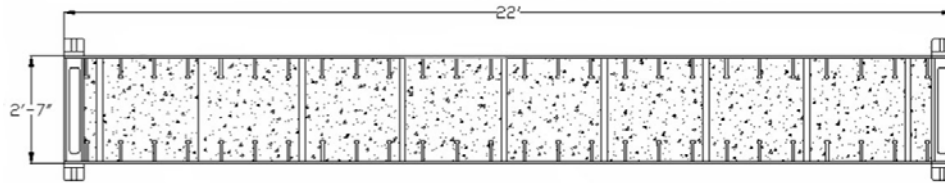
Dimensions and Detailing of Specimen 1 and 2
